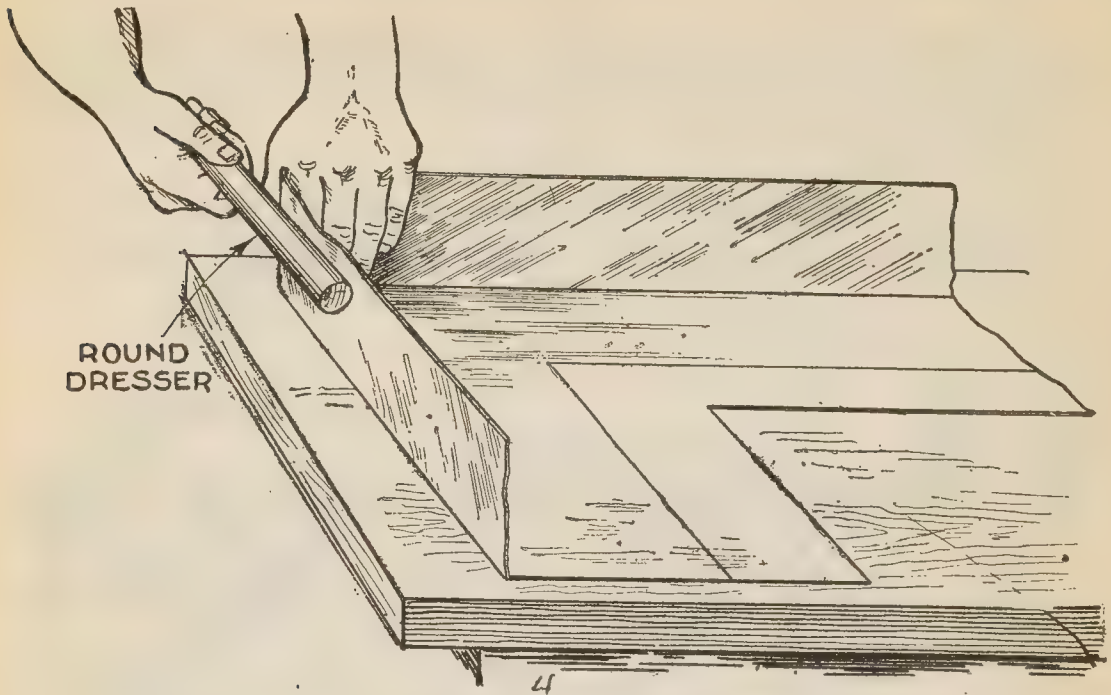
,546.—*Beating box gutter corner, 3.* Beating up external corner with round dresser; first step.
